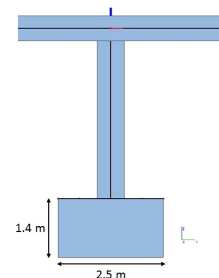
Connection between intermediate abutments, concrete piers and concrete deck in SCIA
